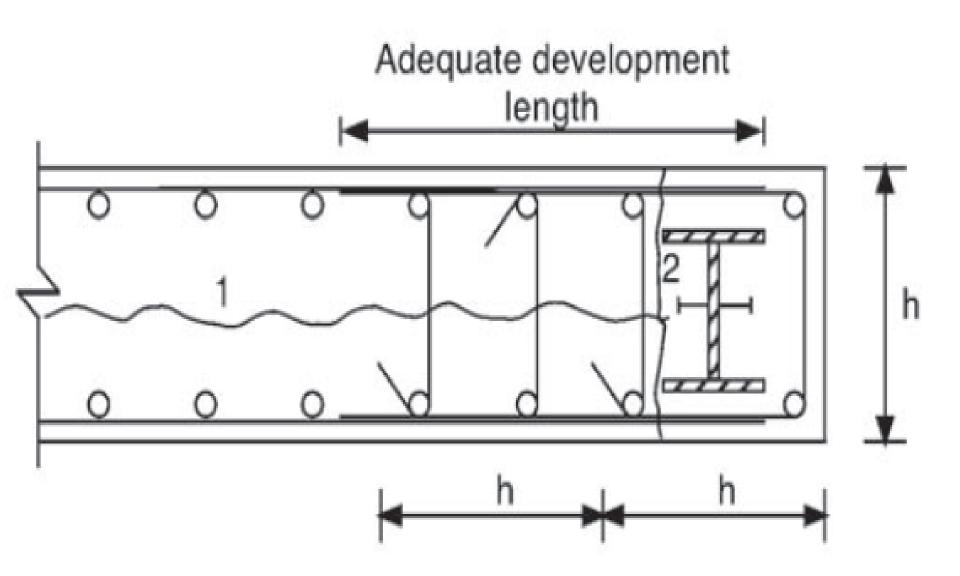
Reinforcement to prevent splitting failures.
